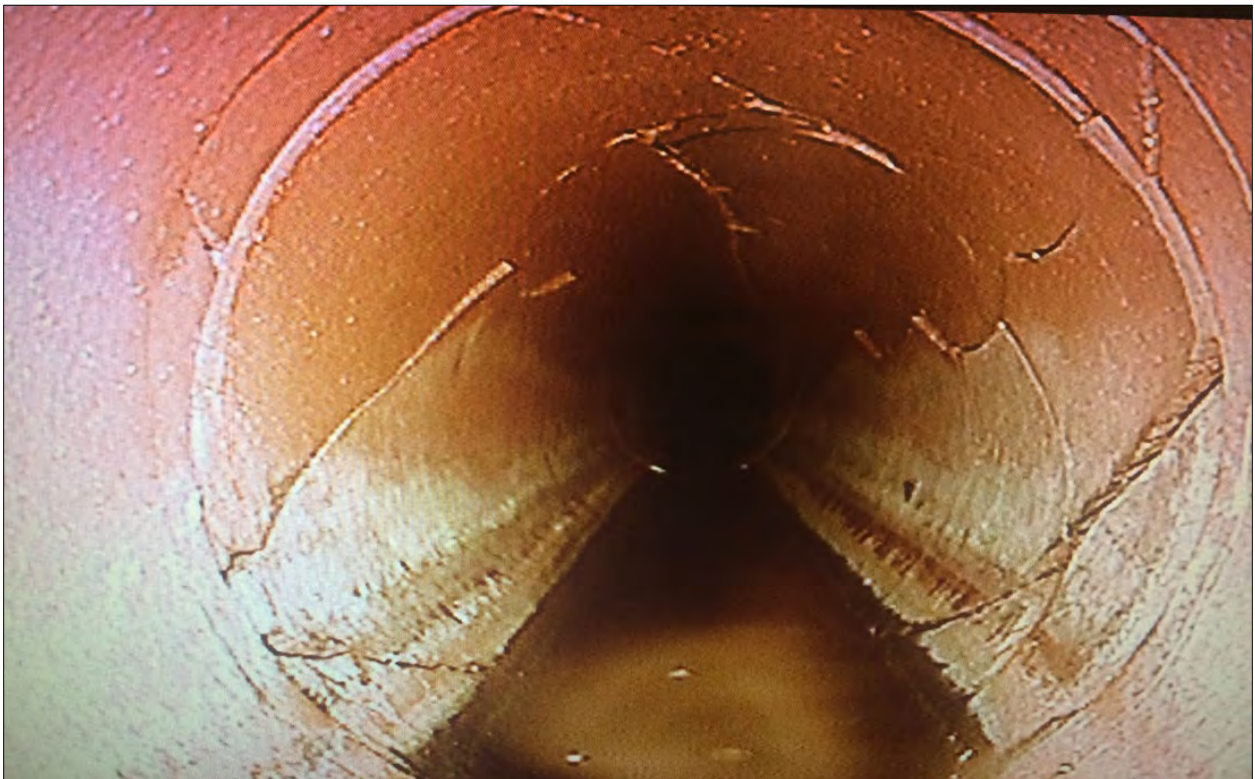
Example of damaged vitrified clay sewer collection system pipeline.
